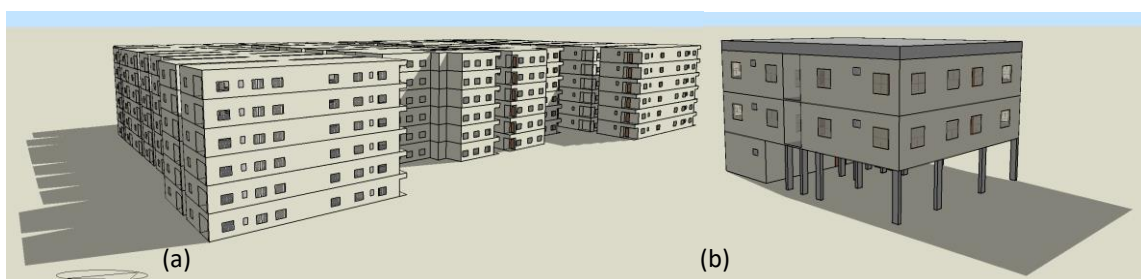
Base models of (a) building typology 1 (BT1) and (b) building typology 2 (BT2)
